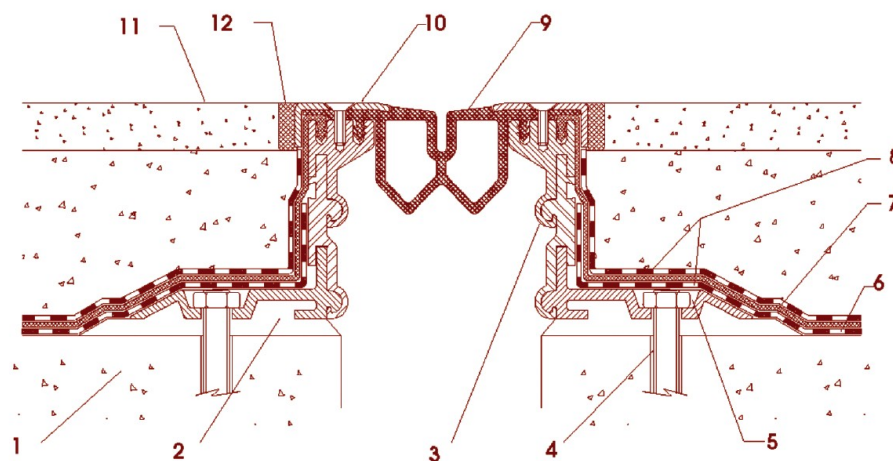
Example of a proprietary joint system using a raised flanged connection to the structural deck below.
